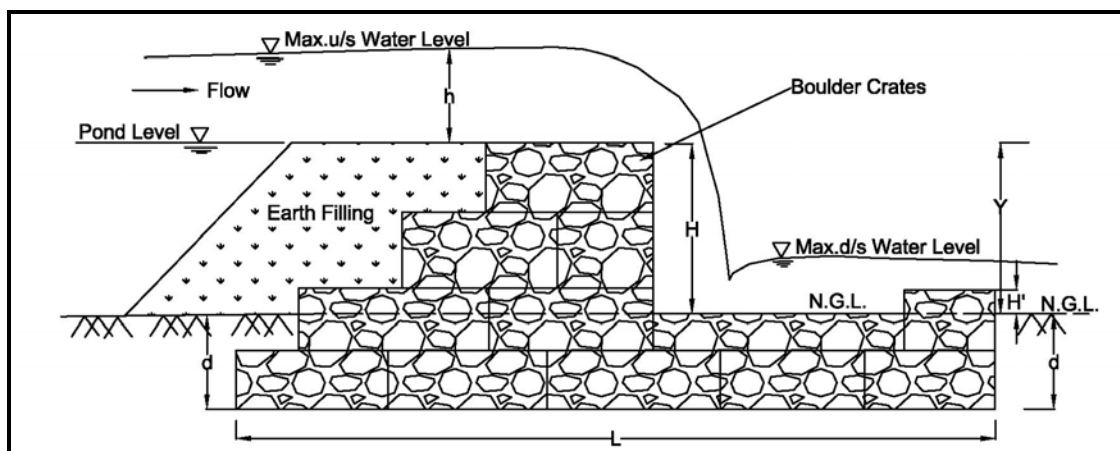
(b): Typical Section of Gabion Weir with Downstream Protection Works
